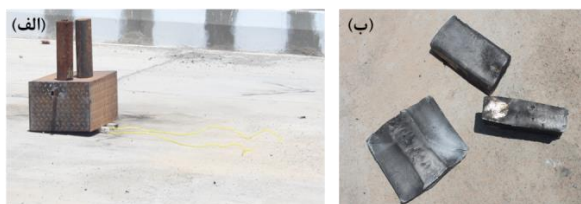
a) Indoor explosion test, b) Exploded specimens
